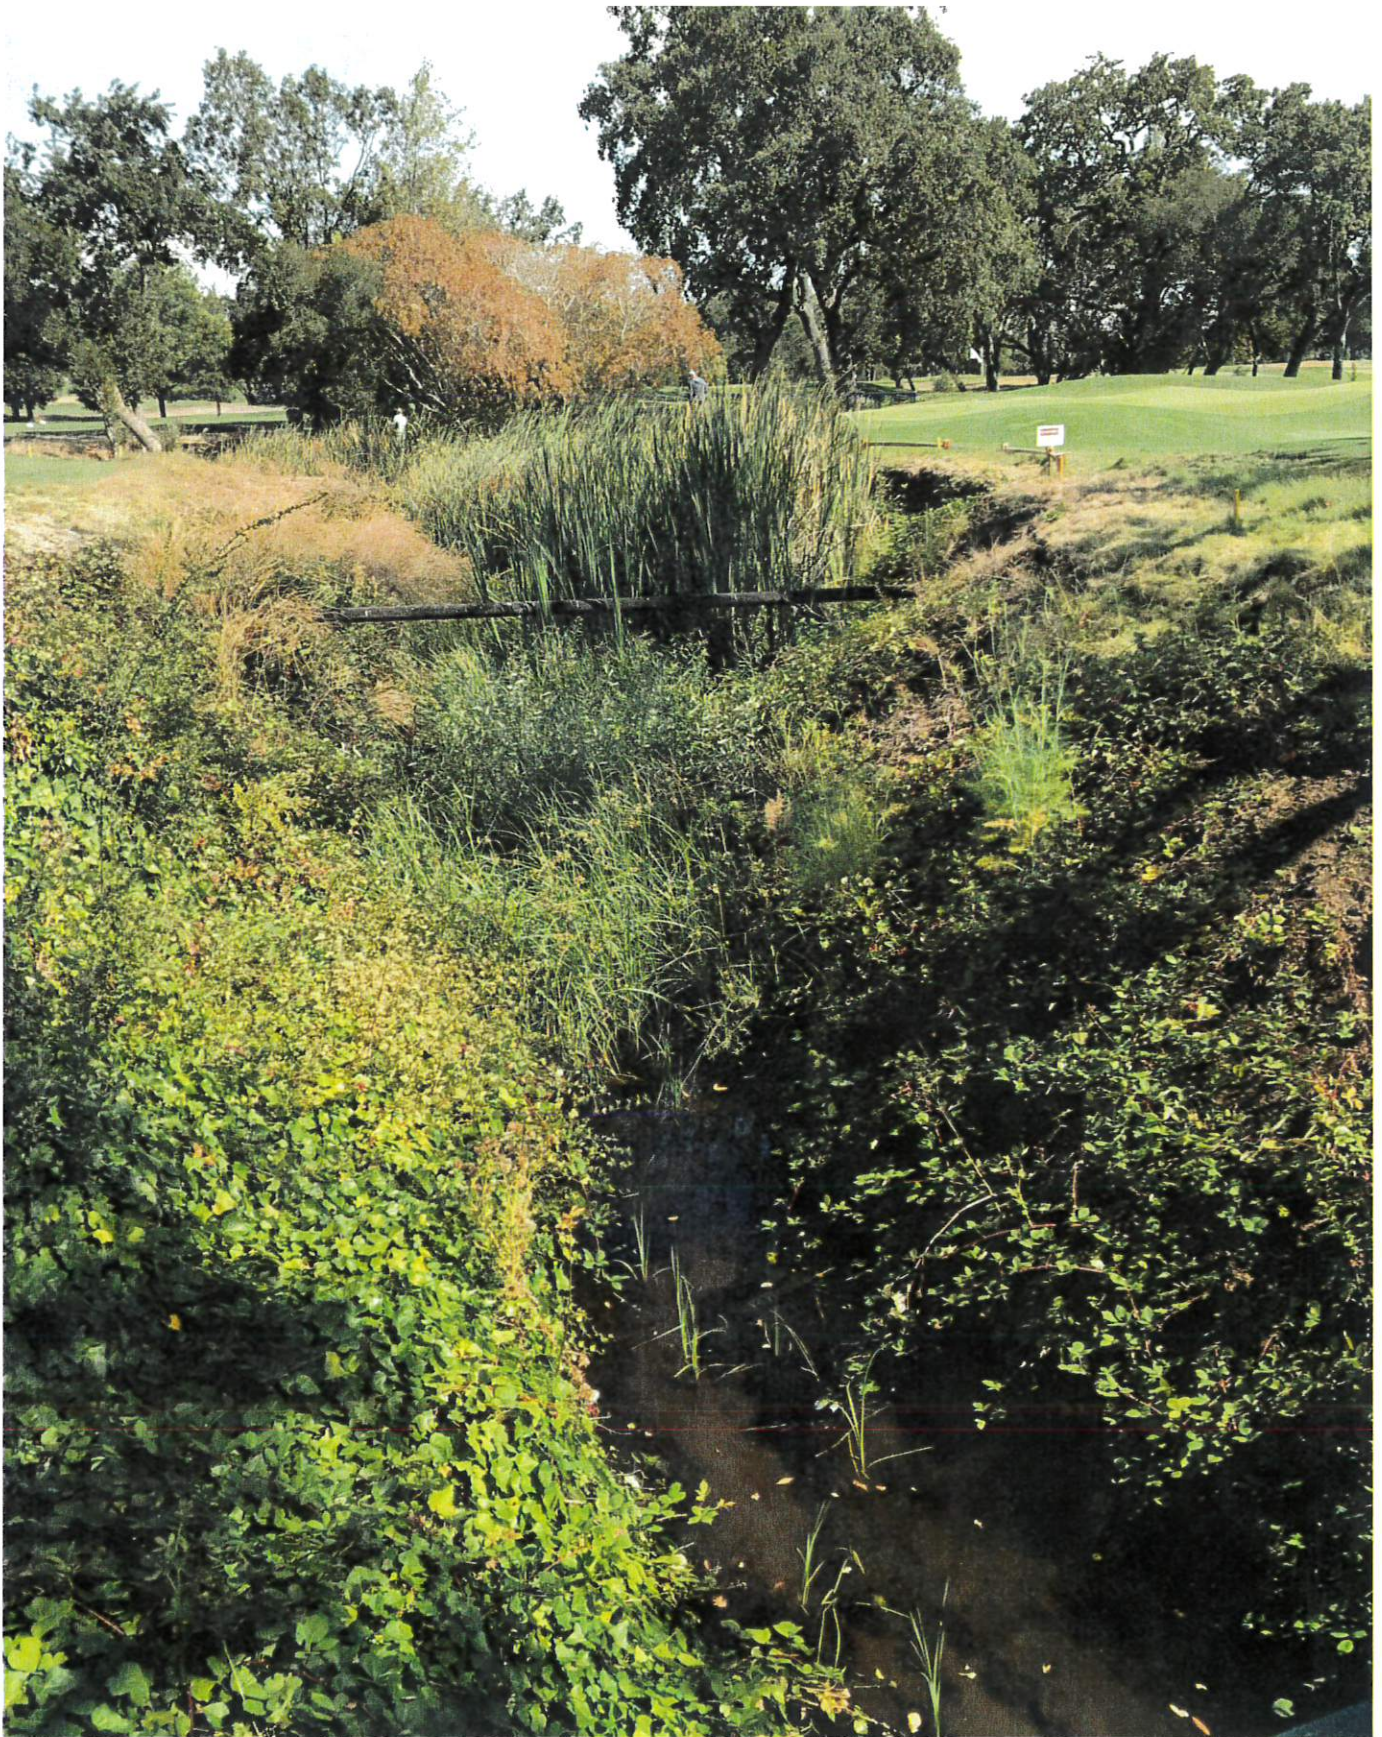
Hole 16. Redwood Creek and eroding bank, looking south (8/27/2018).
